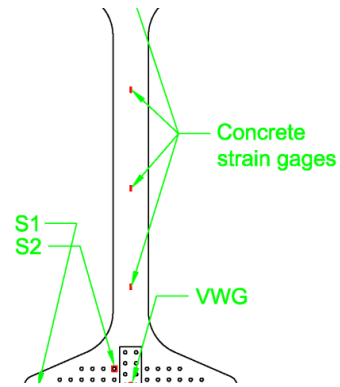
Test 2 instrumentation at midspan of Girders 1 and 2 (G1-A and G2-A)
